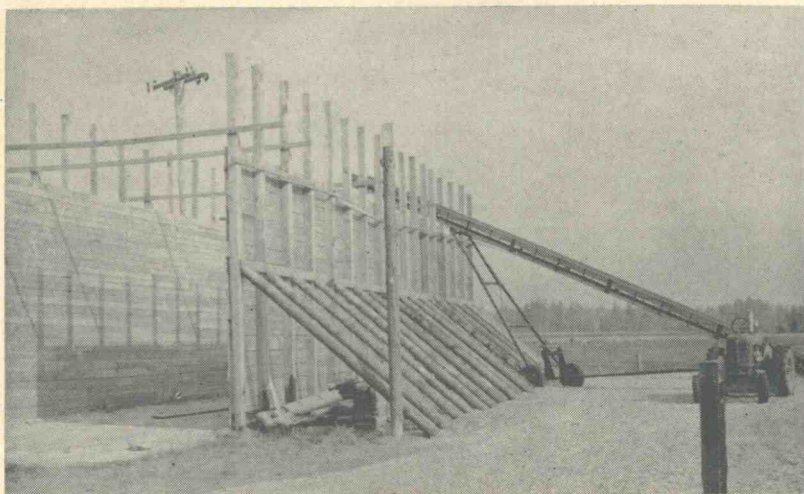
A conveyor may be used on both tower- and bunker-type silos.
